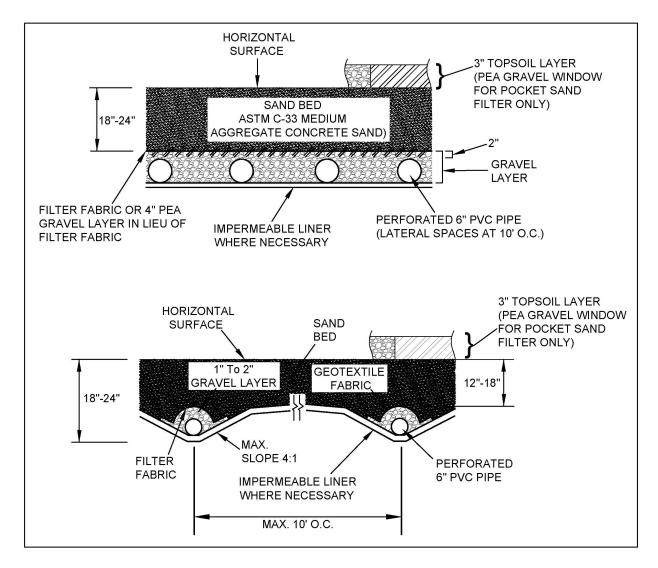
Typical Sand Filter Media Cross Sections (Source: Clayton and Schueler, 1996).
